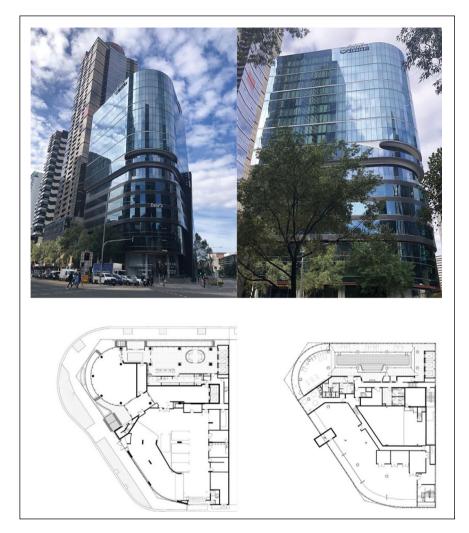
Pictures and floorplans of an existing building extension with a timber structure
